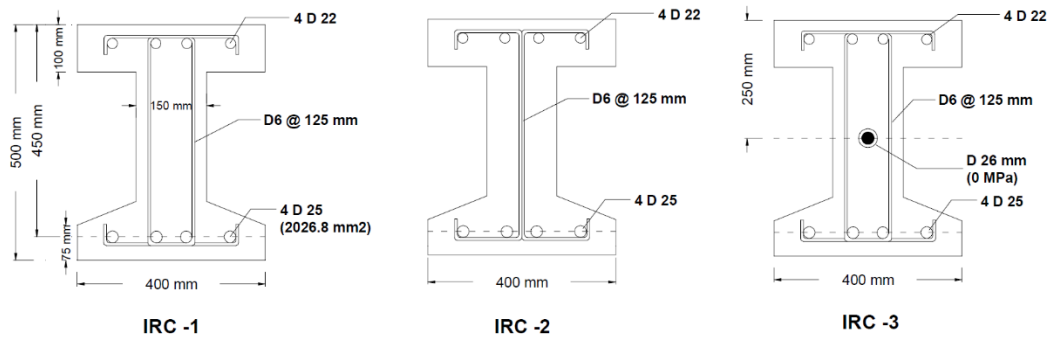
Cross section details of RC beams (De Silva et al., 2008)
